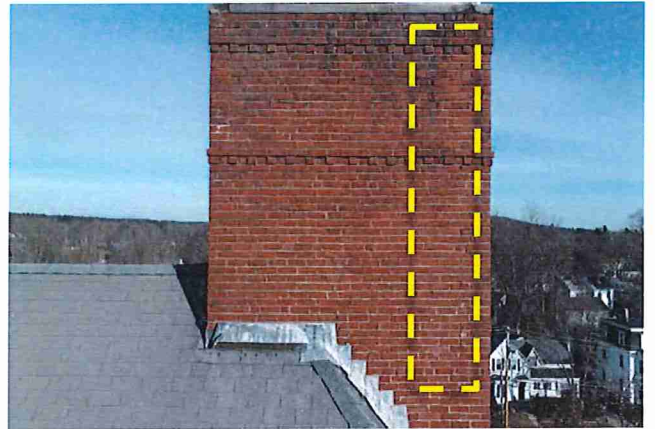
Drone image shows deteriorated mortar joints and step cracking (dashed outline) on the south side of the chimney. The metal flashing, which appears to be lead, at the chimney base is torn open, allowing moisture to bypass the flashing and migrate to the underside of the shingles, and building interior.
